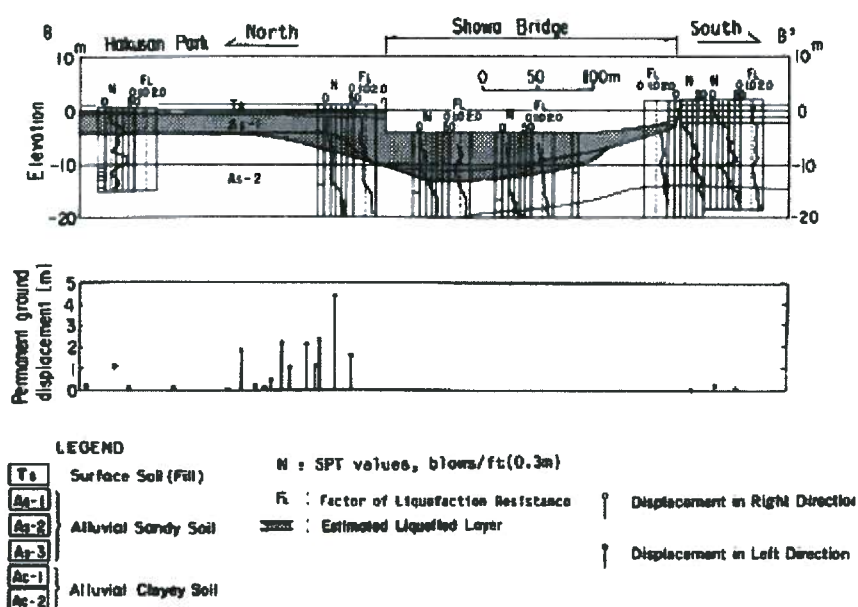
Soil profile in the Showa Bridge site (Hamada, 1992).
